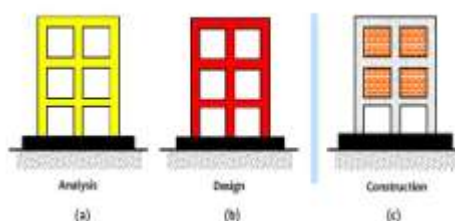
Unreinforced Masonry Infill Walls in RC Frame buildings
